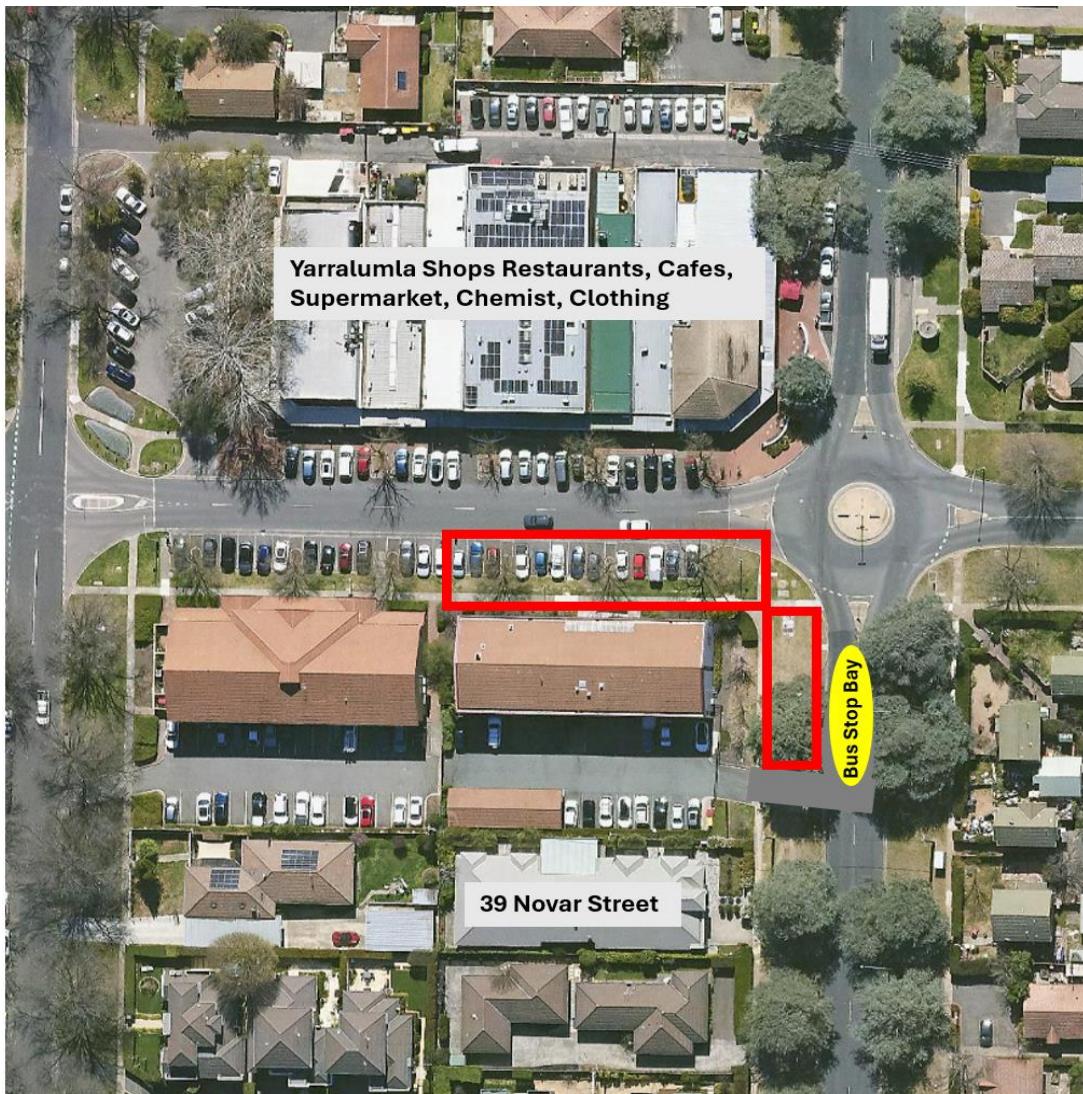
Demolition/Construction Materials- Areas Outside Development Site that may be used
